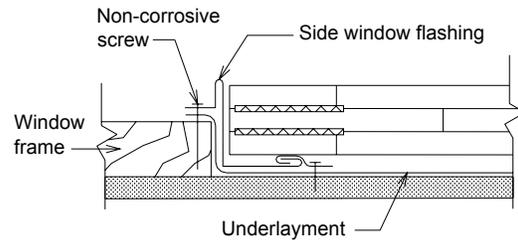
FLASHING AT SIDE OF WINDOW ON DORMER
